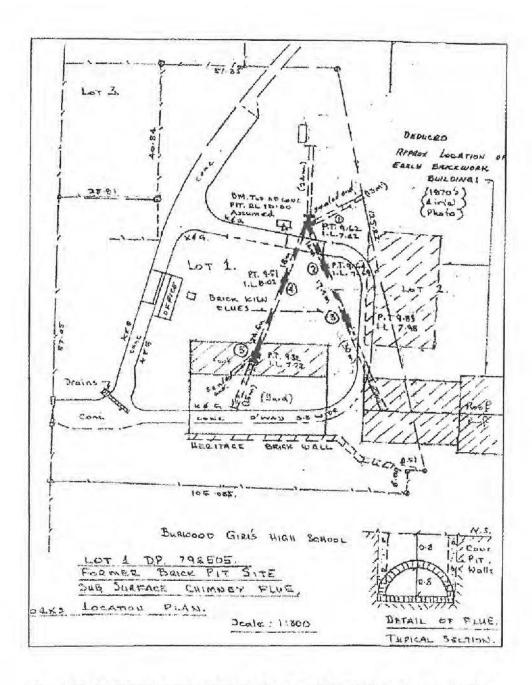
Sketch Plan of the site adapted from a c,1970s aerial photograph showing the subsurface flues and building footprints.
